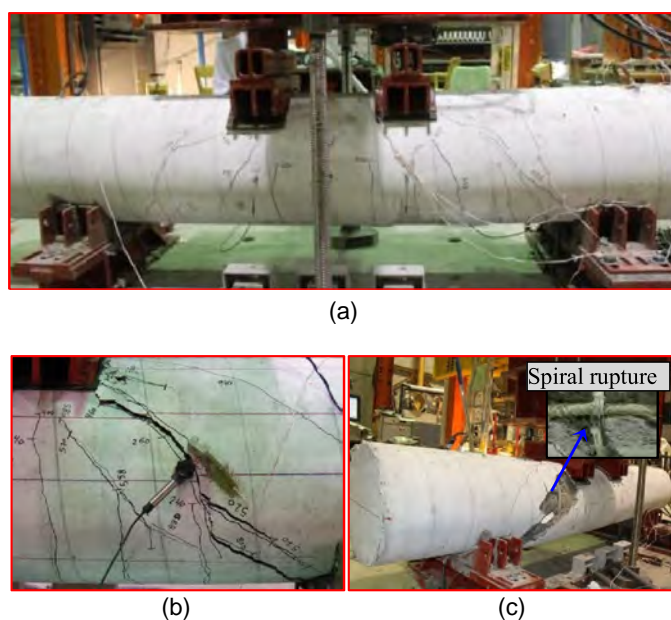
Crack propagation and failure mechanism ($a/d = 2$): (a) crack pattern at a load level of 65% of failure; (b) crack pattern at a load level of 90% of failure; (c) crushing of the compression strut and spiral rupture
